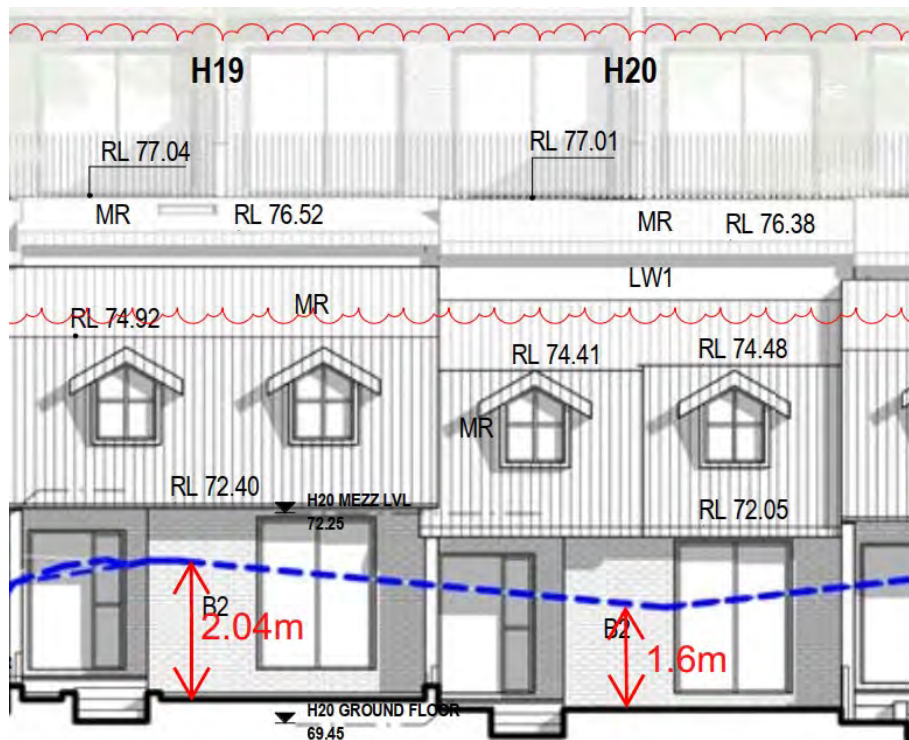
Extract from the Elevations Plan showing examples of proposed cut to Dwellings H19 and H20 (natural ground line is shown dashed)
